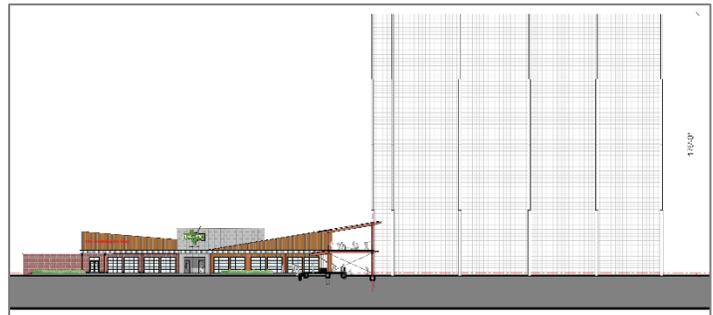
CONCEPT BUILDING ELEVATIONS
